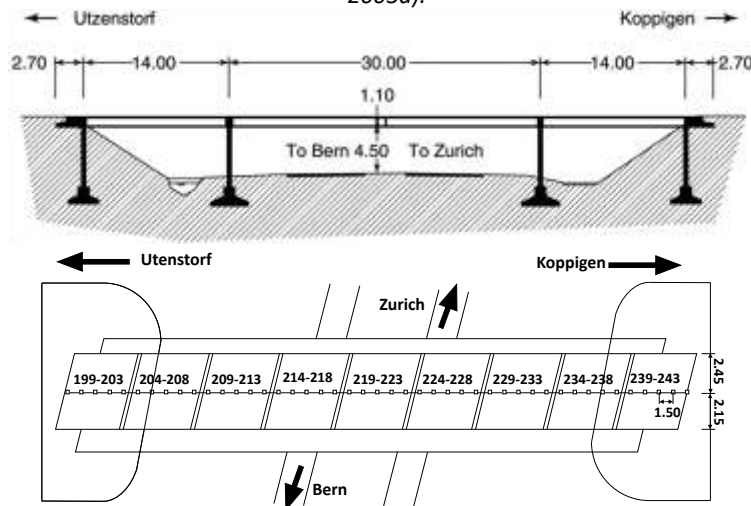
Cross section of the bridge and layout diagram of sensors on the bridge.
